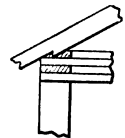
Construction at B² of Fig. 53.—Scale, $\frac{1}{4}$ Inch to the Foot.
